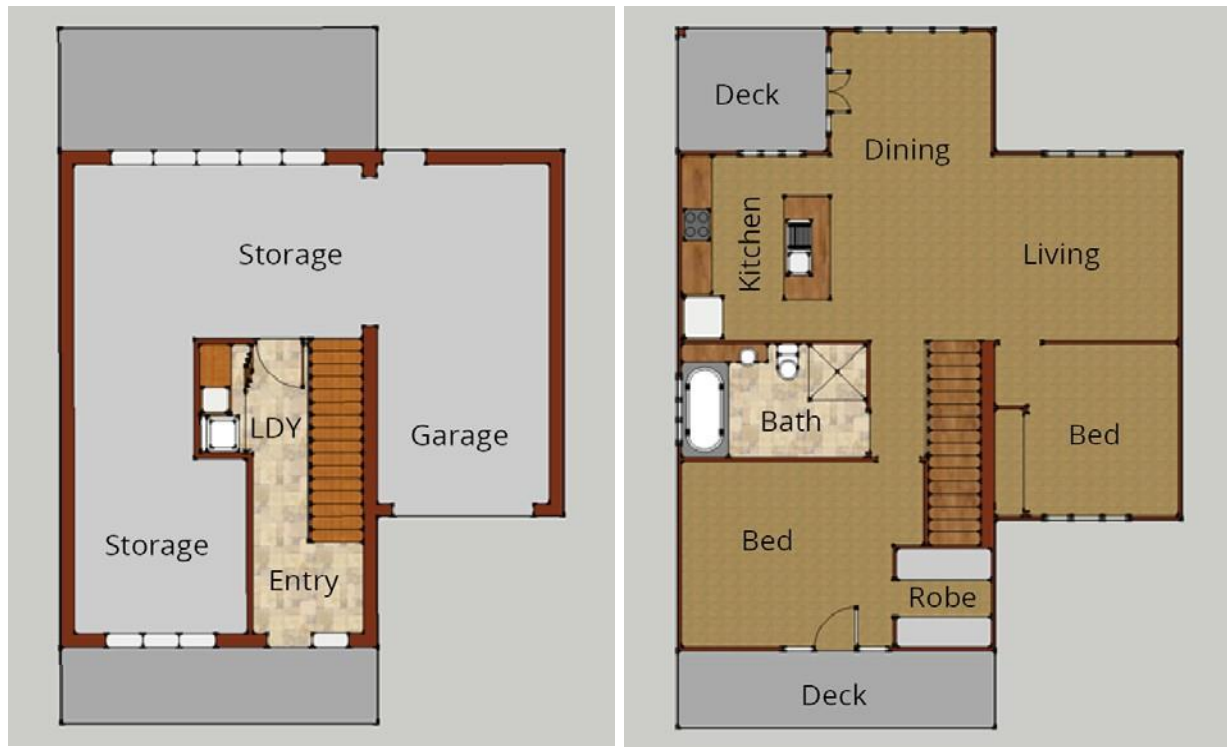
New Residential Development on Flood Prone Land: All habitable floor space located above the FPL. Ground floor area nominated for use as garaging and/or storage (non-habitable space).
